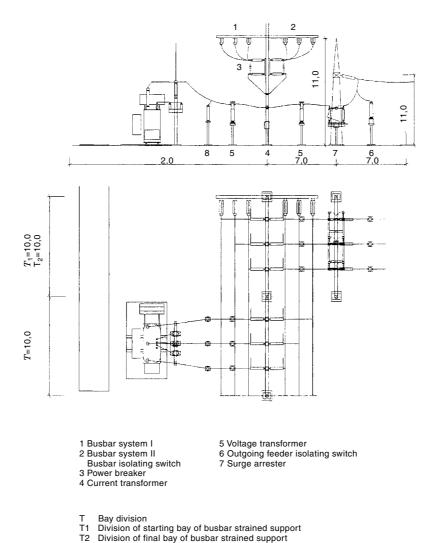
123 kV outdoor substation with double busbars: high-profile or T-pole construction.
